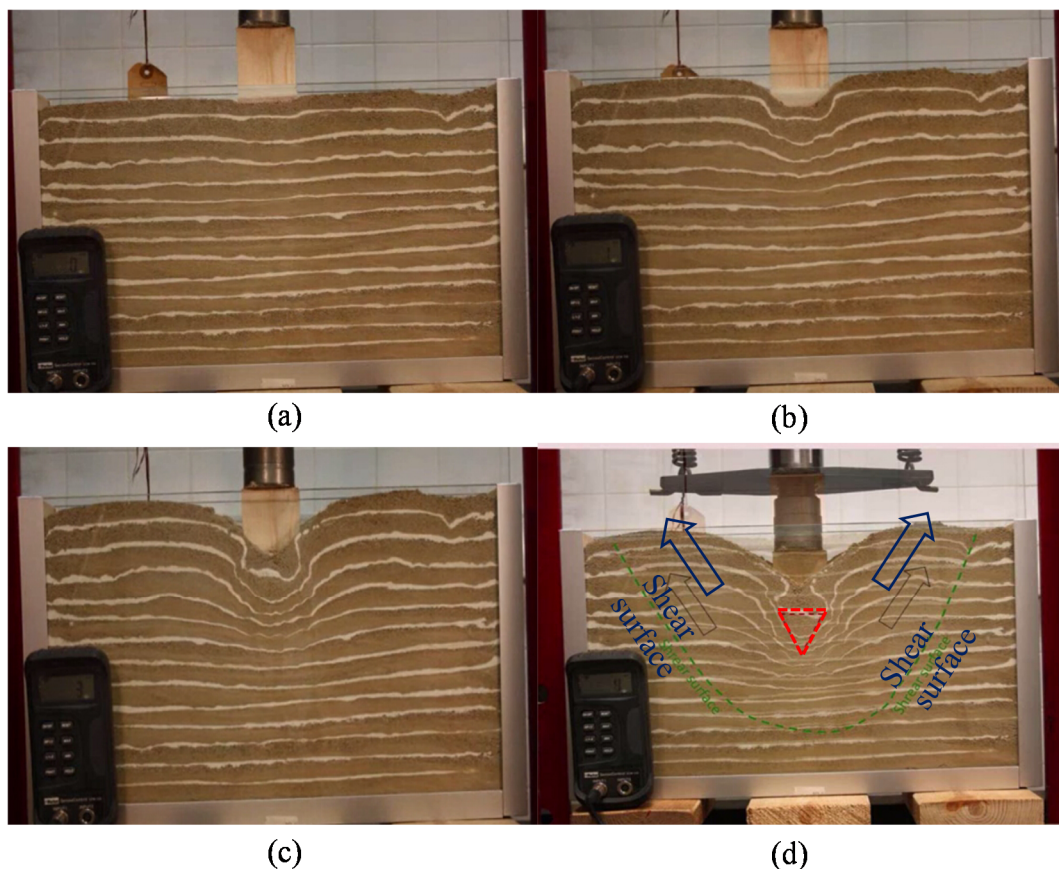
Soil failure under footing by geo-hazard tank model: (a) initial state; (b) formation of the triangle area under footing; (c) laterally uplift outward; (d) formation of slide surface
